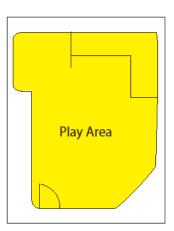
Jeff Gordon's Play Room Plan. Not to scale.
